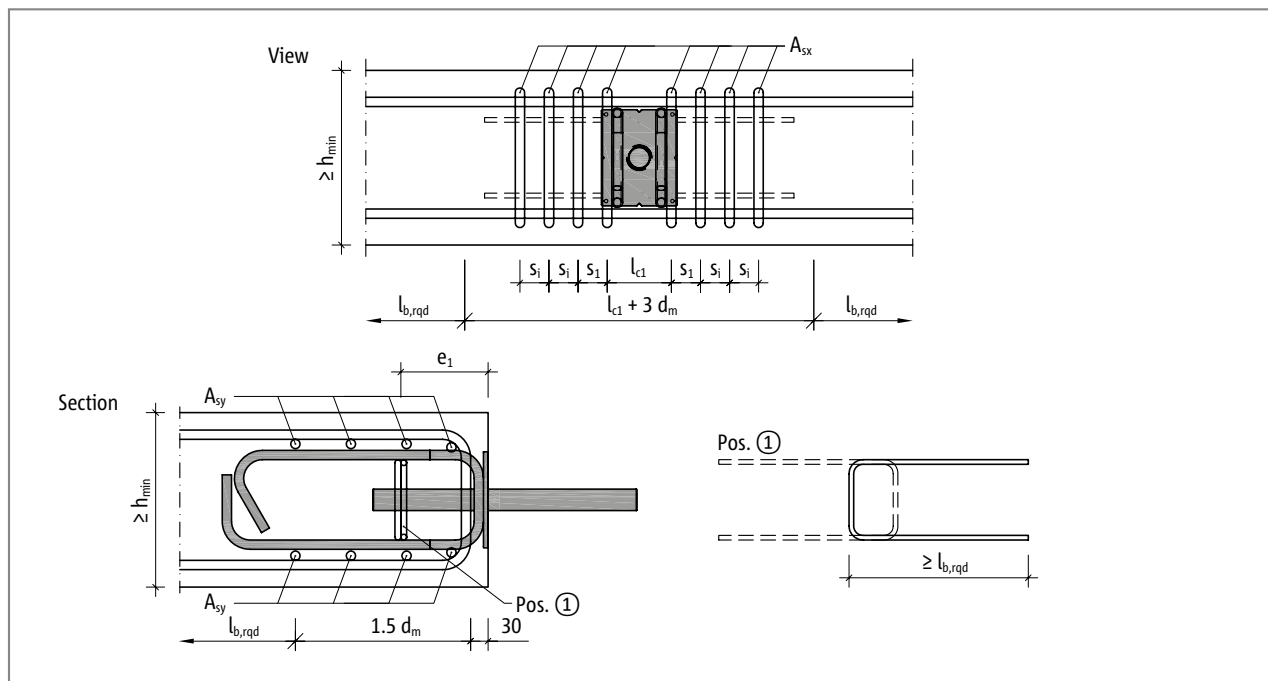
Schöck Dorn type SLD 120, SLD 150: On-site reinforcement
